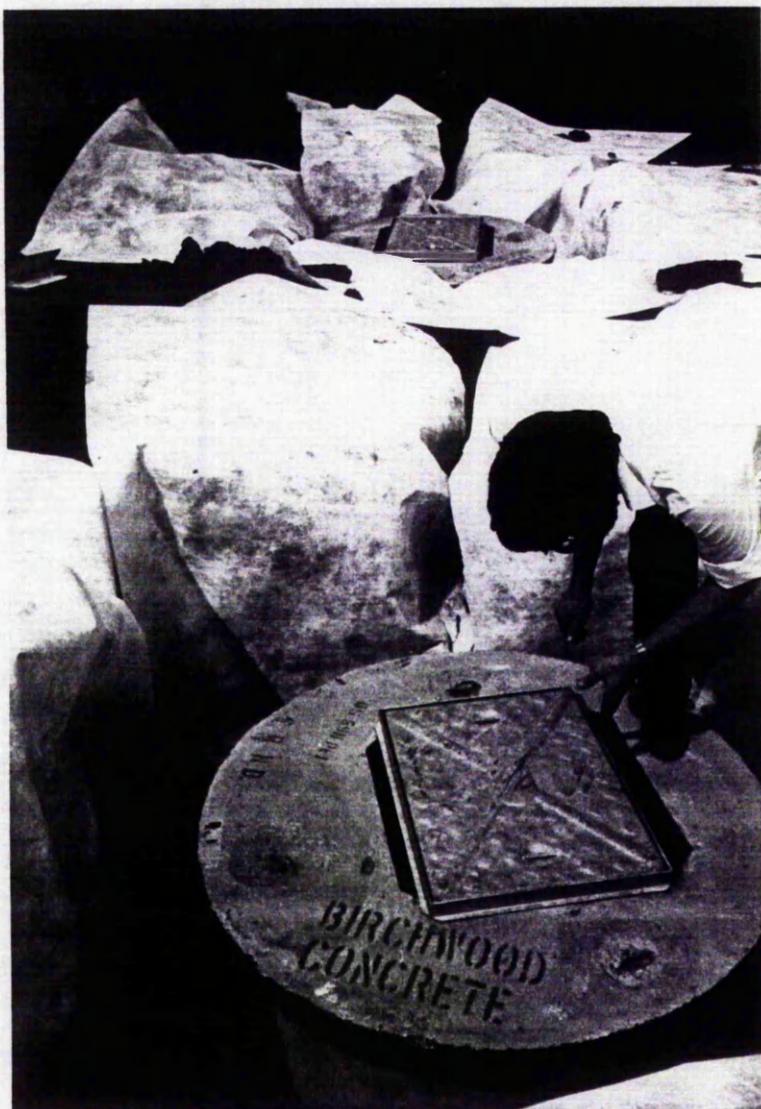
Dual-chambered soakaway nearing completion, geotextile and concrete rings in place.
